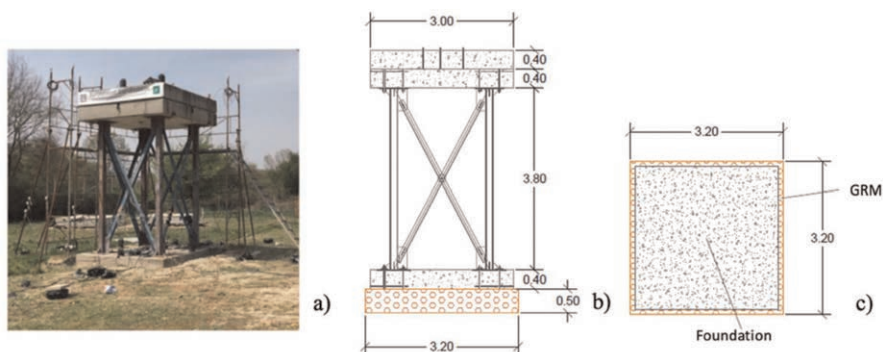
(a) Photo, (b) section and (c) plan view of EuroProteas with the adopted GRM underneath the foundation (lengths in meters).
